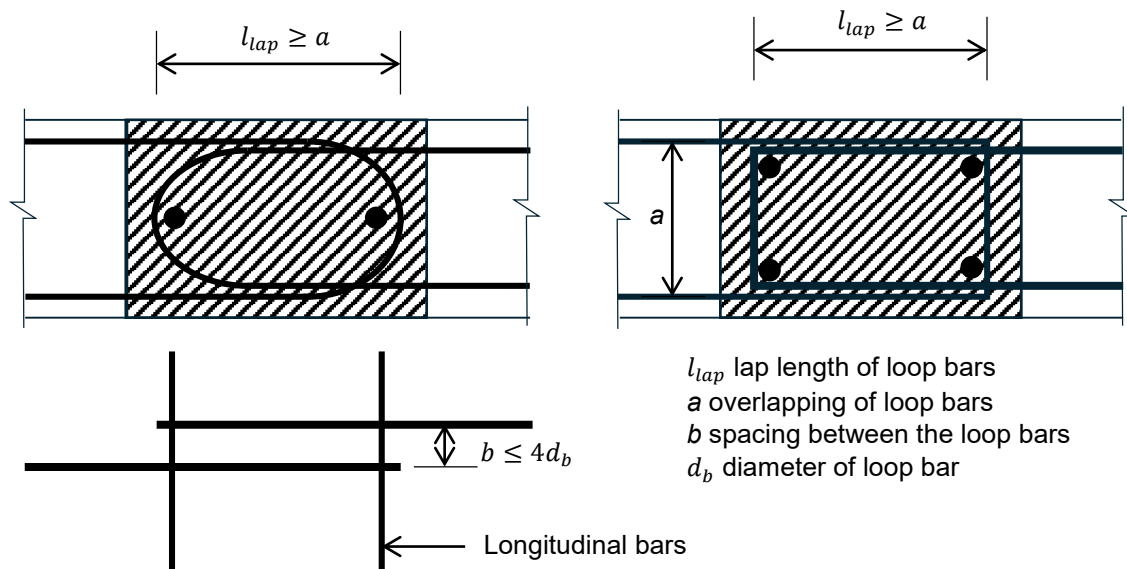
REINFORCEMENT LOOP JOINT FOR TRANSFERRING TENSION
